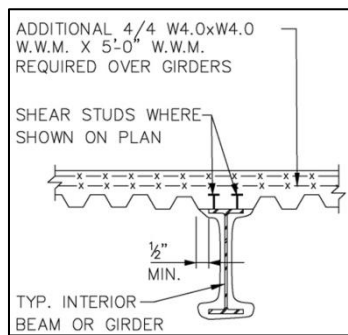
Typical Floor Construction, Metal Deck Parallel to Beams or Girders
